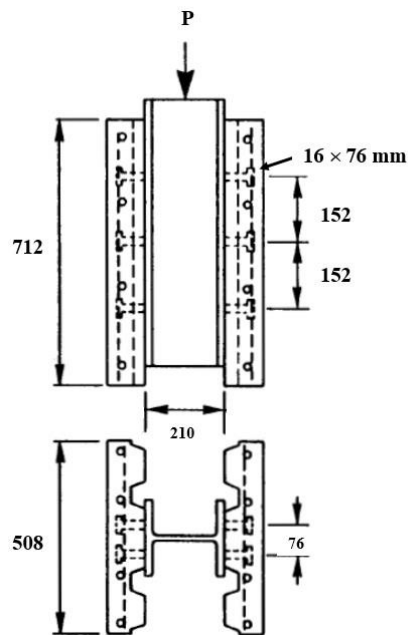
Push test arrangement of JDT-3 in Jayas and Hosain (1988)
